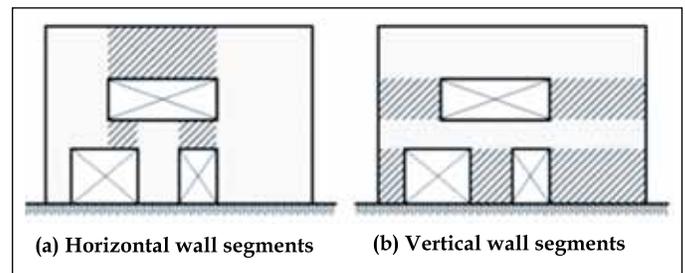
Wall with openings-vertical and horizontal wall segments (hatched)
